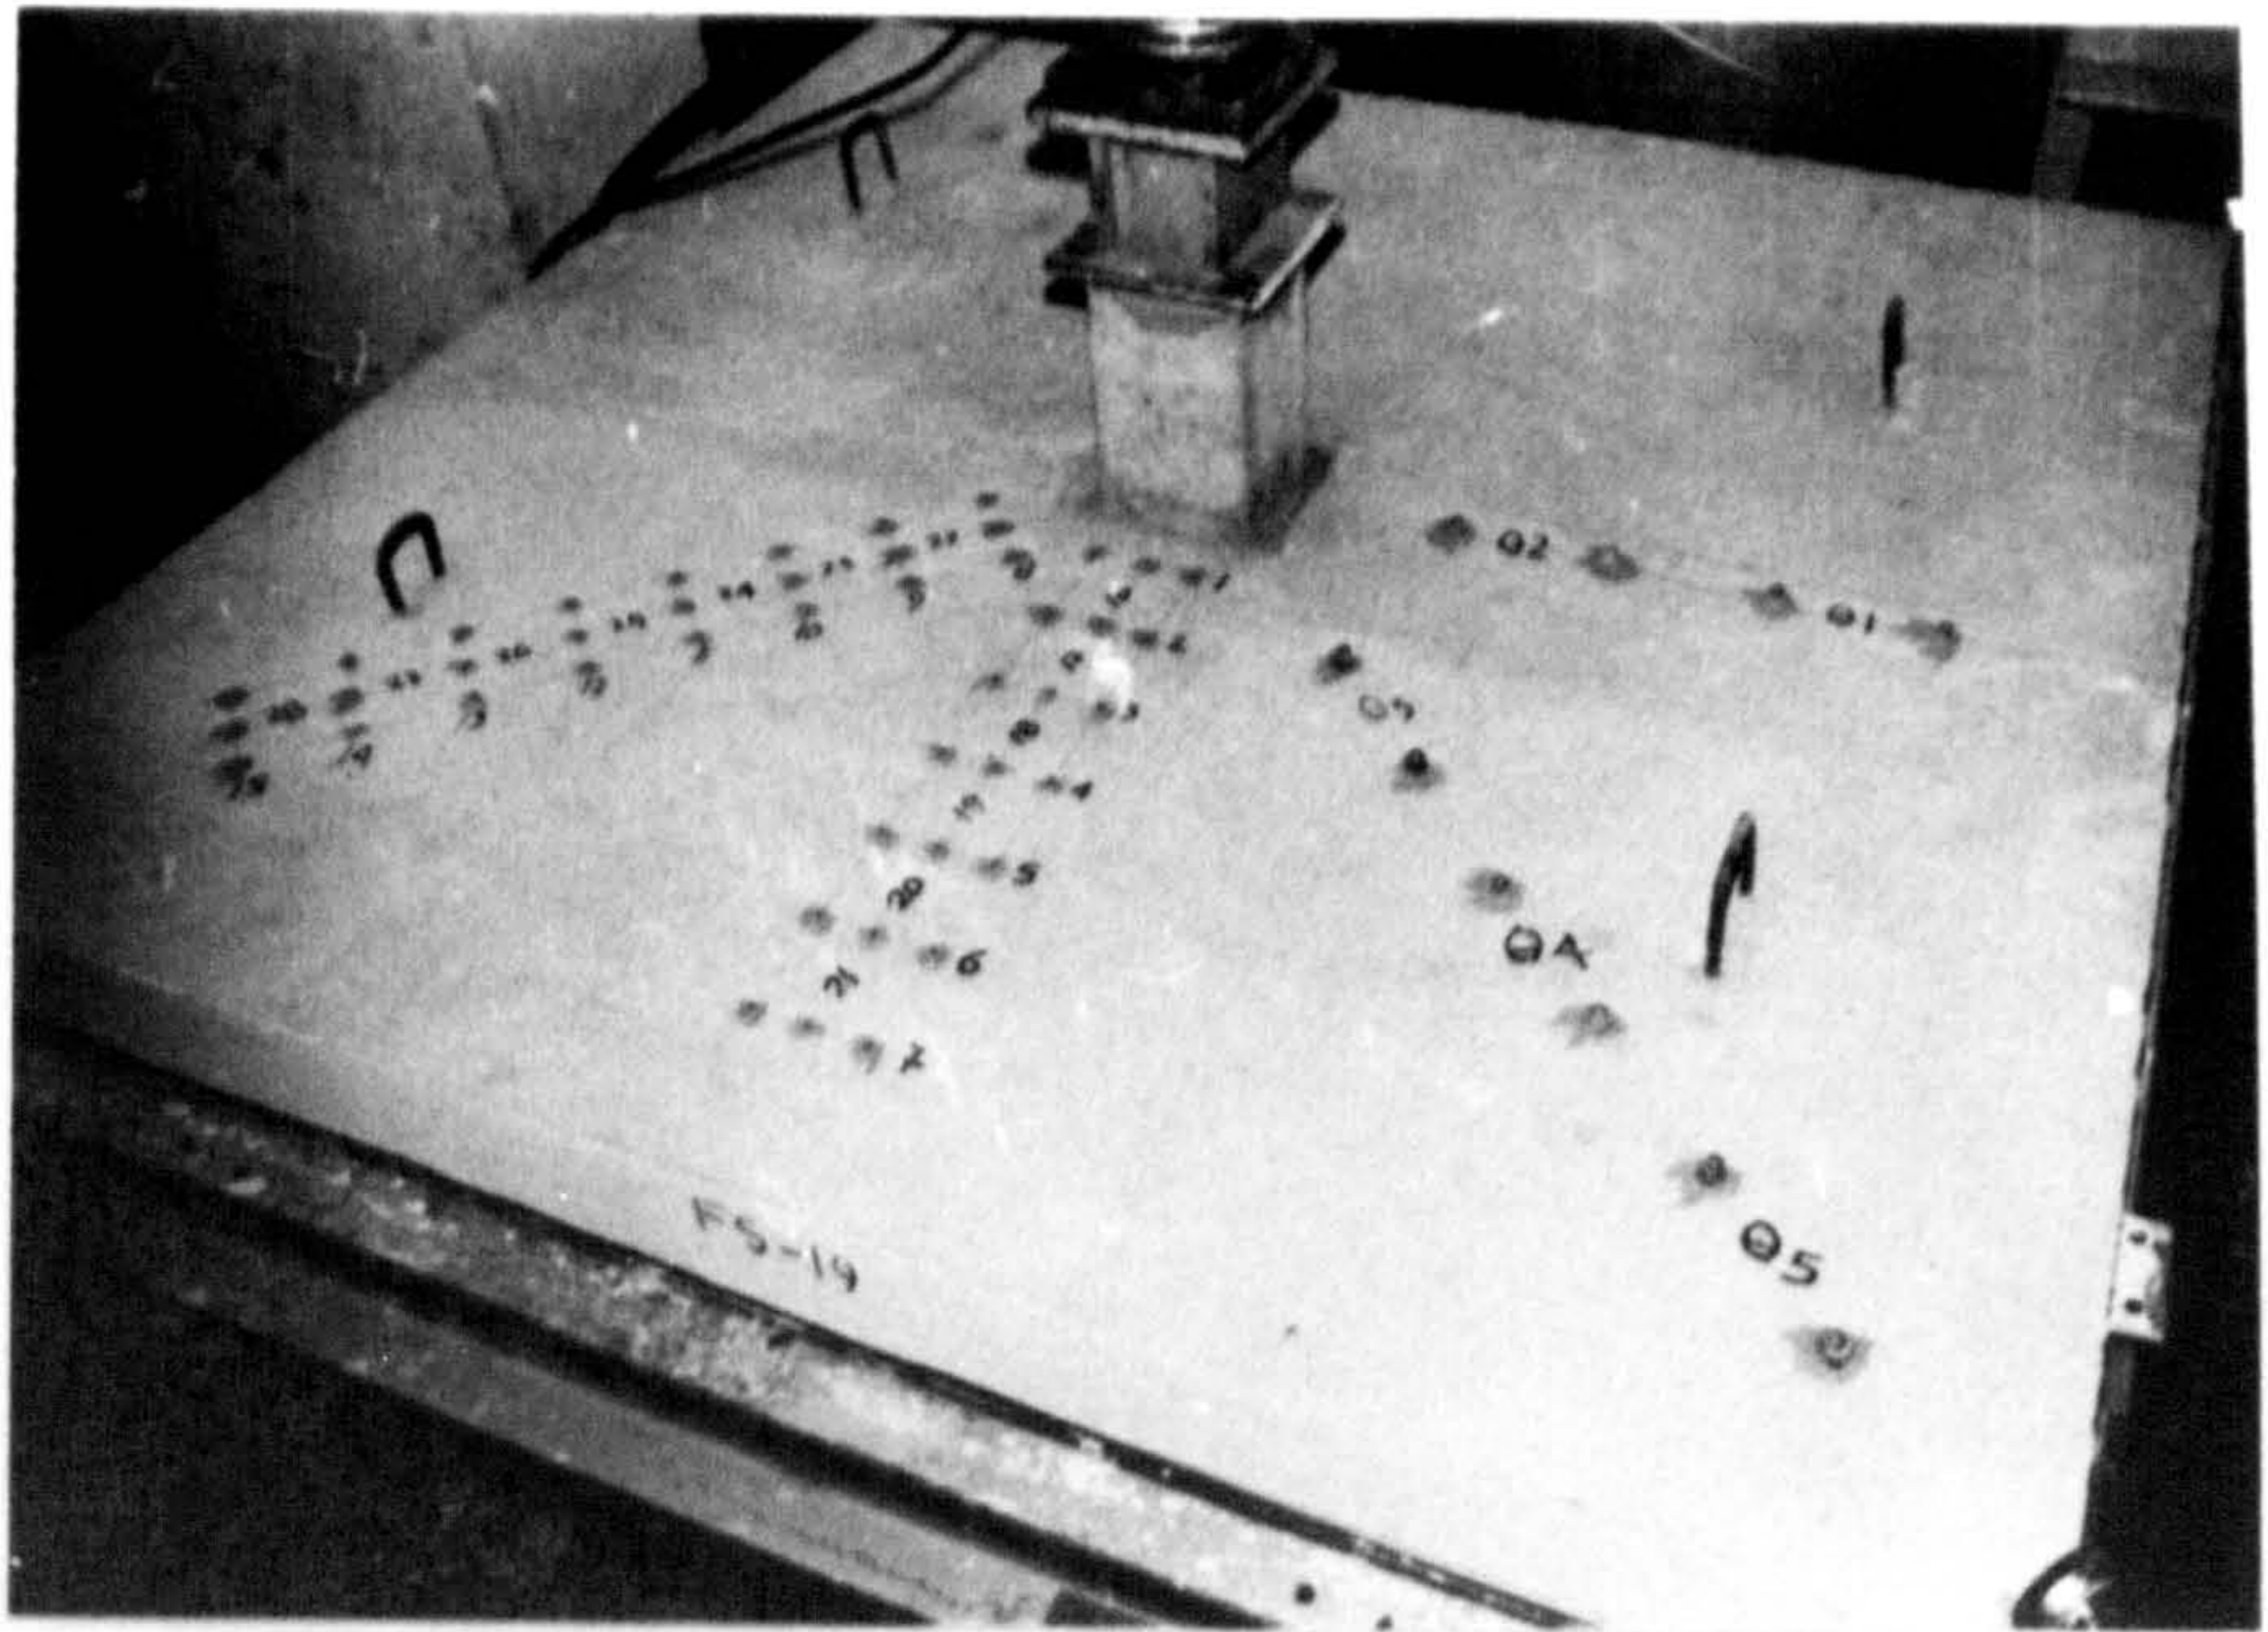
SLAB TEST SPECIMEN COMPRESSION FACE DETAIL
